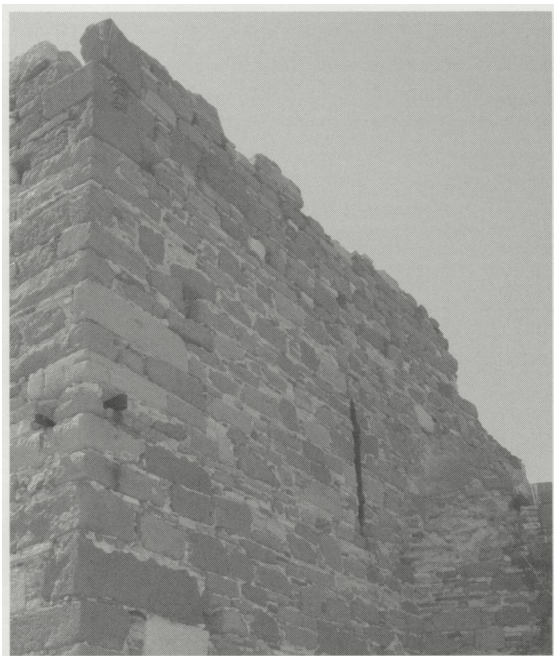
Photo illustrating the wall reinforcement and tie-rod anchor at the southeastern corner.
